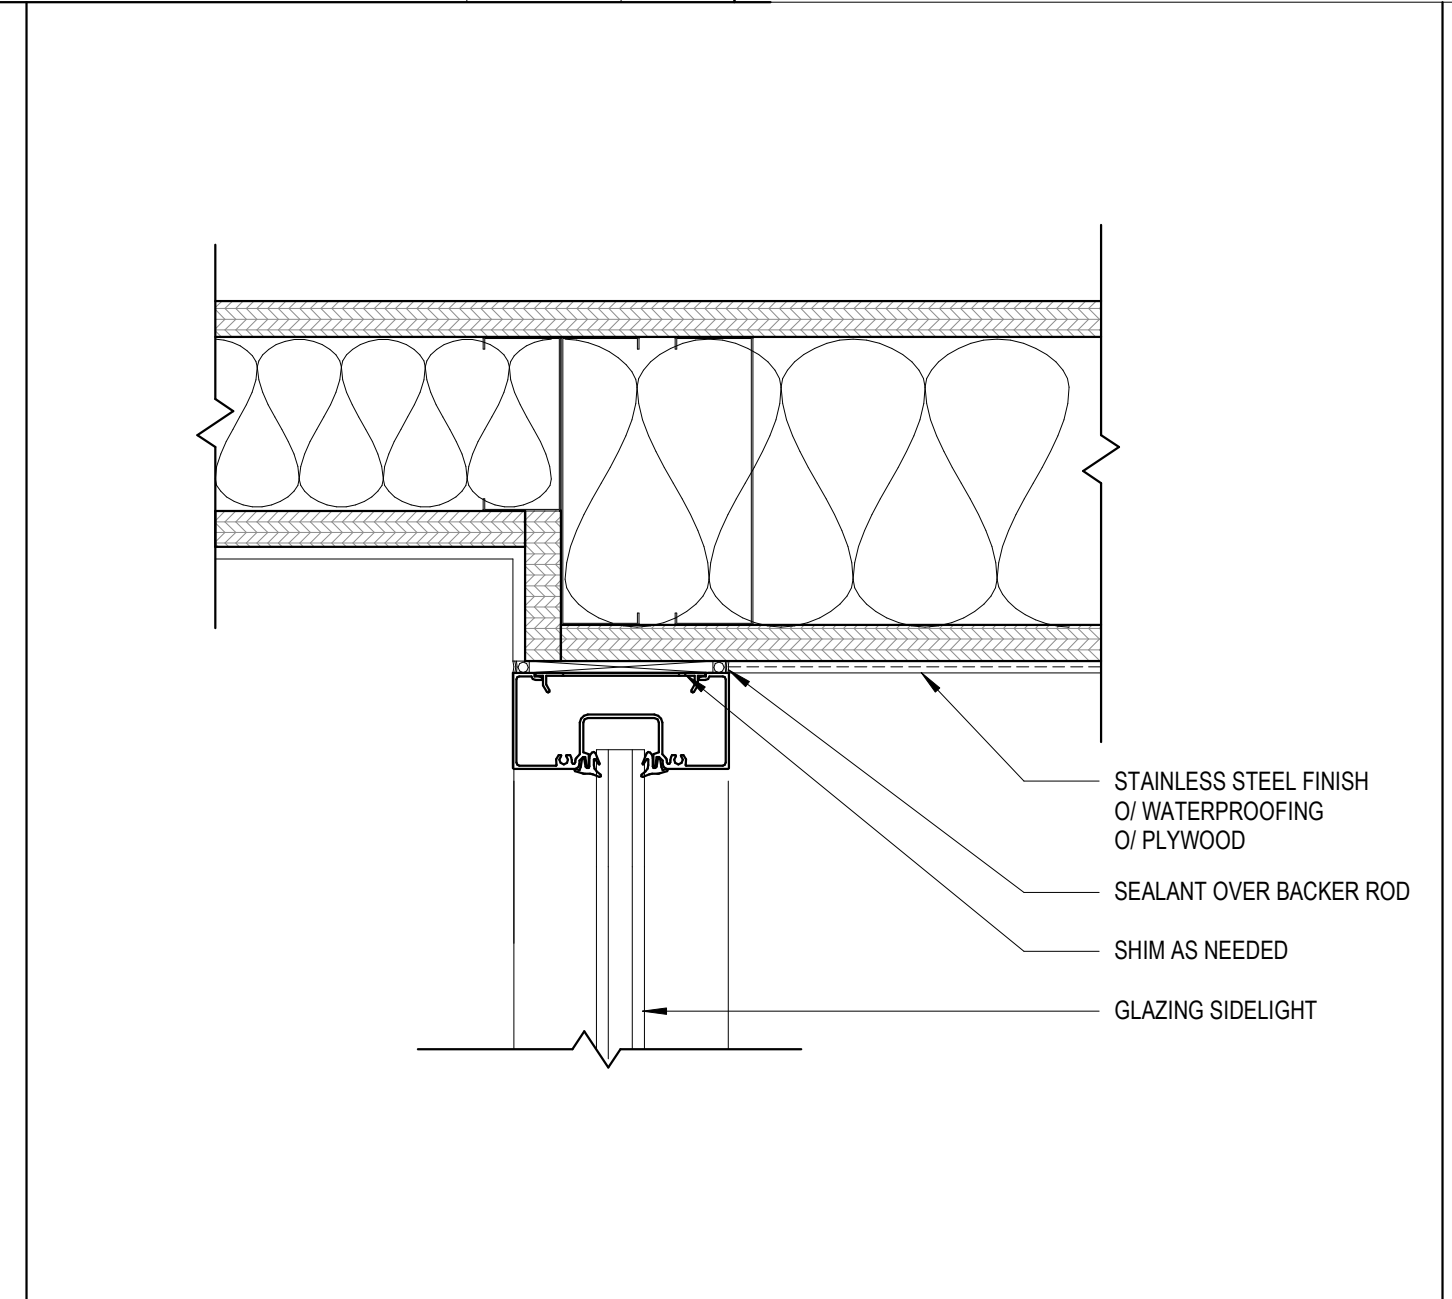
DETAIL AT DOOR HEADER SCALE: 3" = 1'-0" 5
